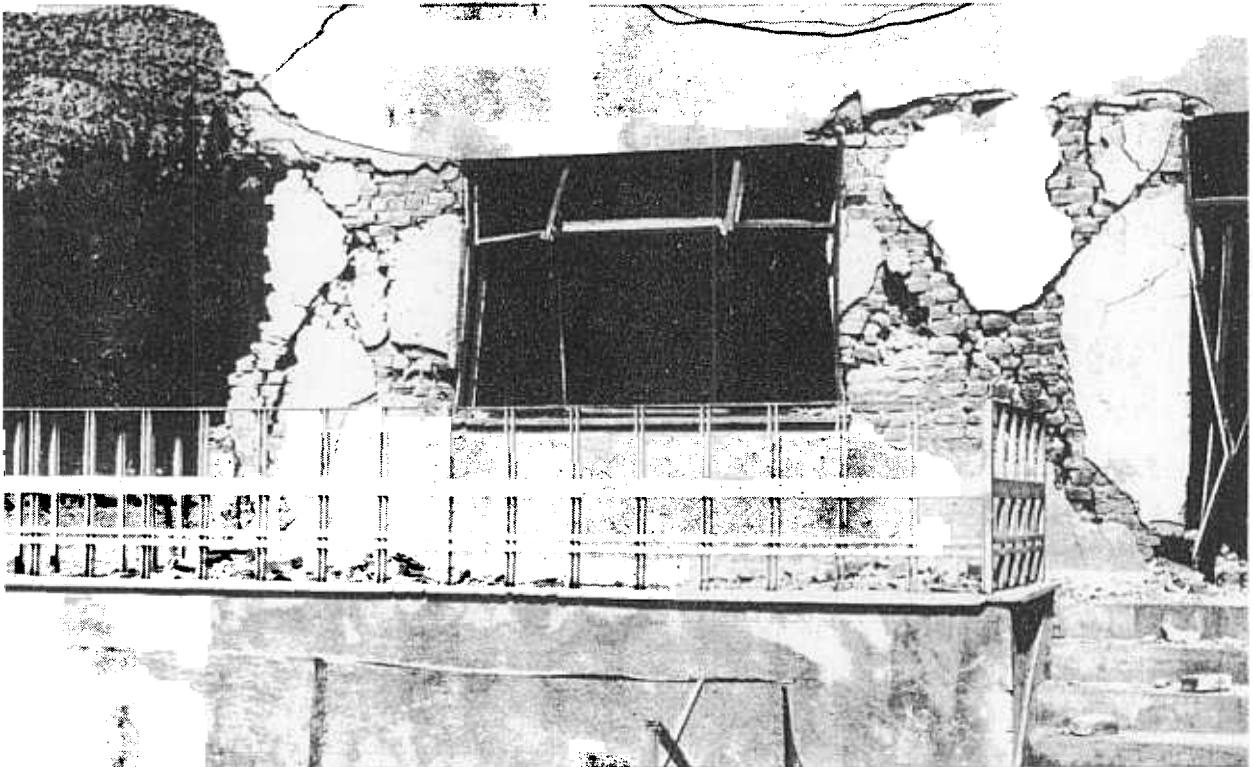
SHEAR FAILURE OF THE PIERS OF THE POLICE BUILDING. THE FIRST STORY HAS COMPRESSED A COUPLE OF INCHES, AS SHOWN BY THE BUCKLING OF THE WINDOW AND DOOR FRAMES.
